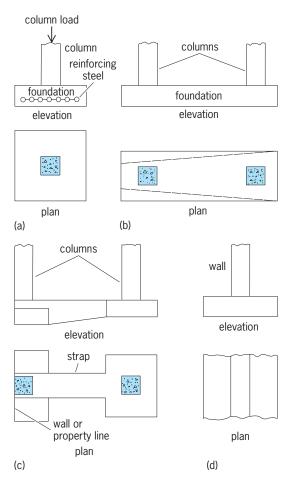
Types of footings. (a) Column footing. (b) Combined footing, which can be either rectangular or trapezoidal. (c) Cantilevered footing. (d) Wall footing.
